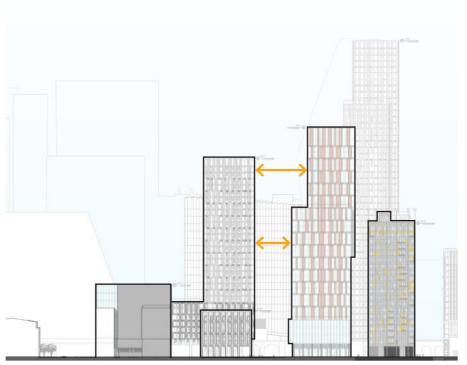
Proposed Elevation to Hopton Street - SH7/SH5 Relationship
